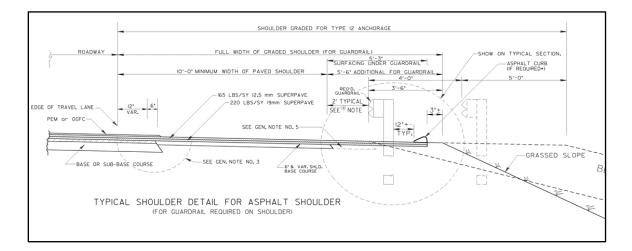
GDOT Drawing Detail S-4-2002 [2]
